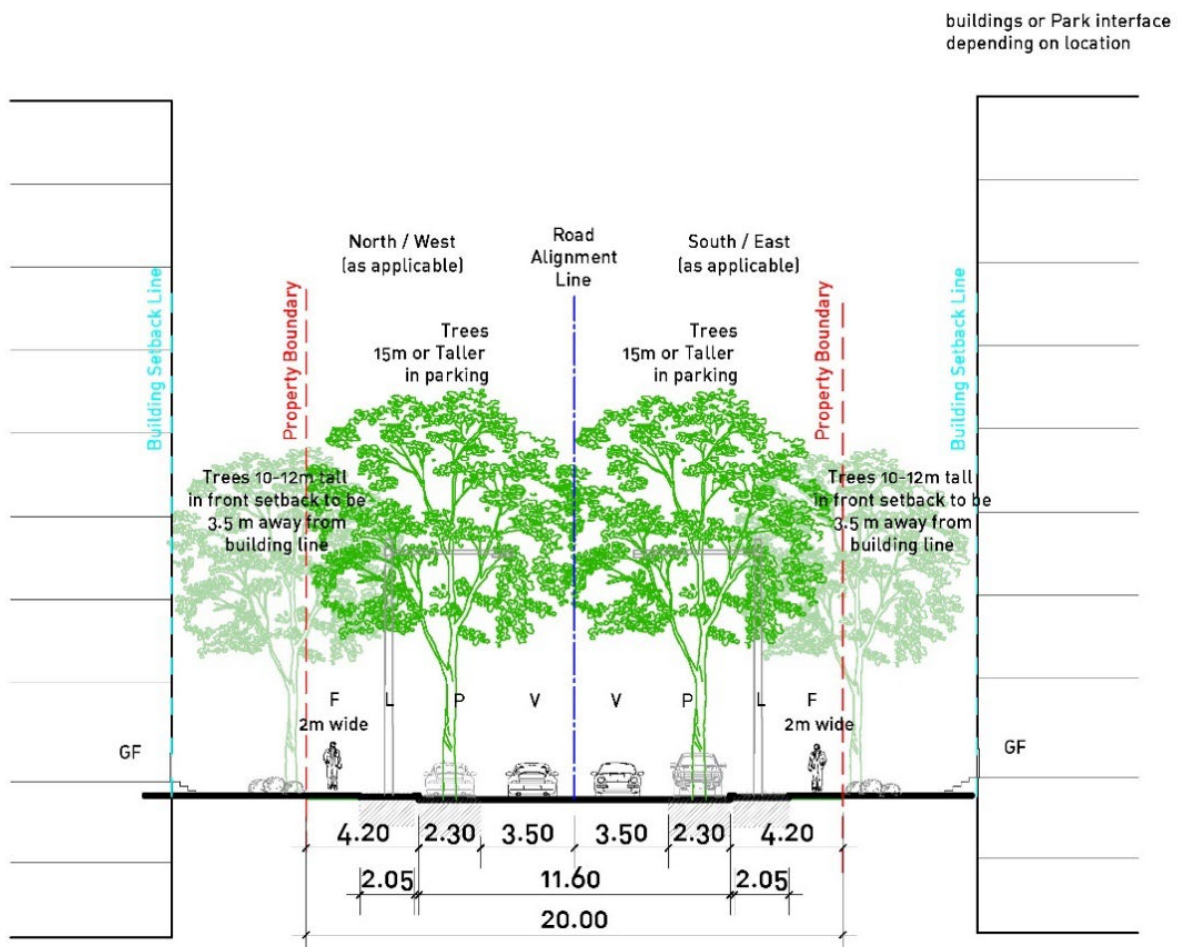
Type 3 Main East West Connector road
